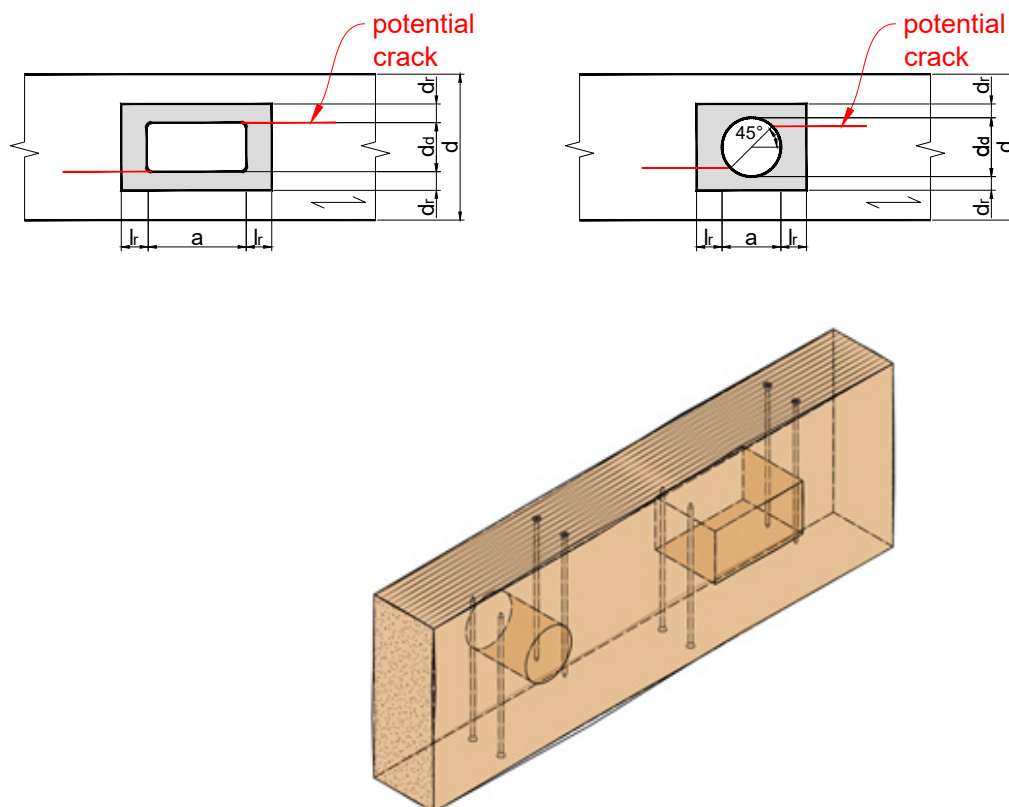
Reinforcement of beams with penetrations with rectangular and round holes reinforced with glued-on panels.
